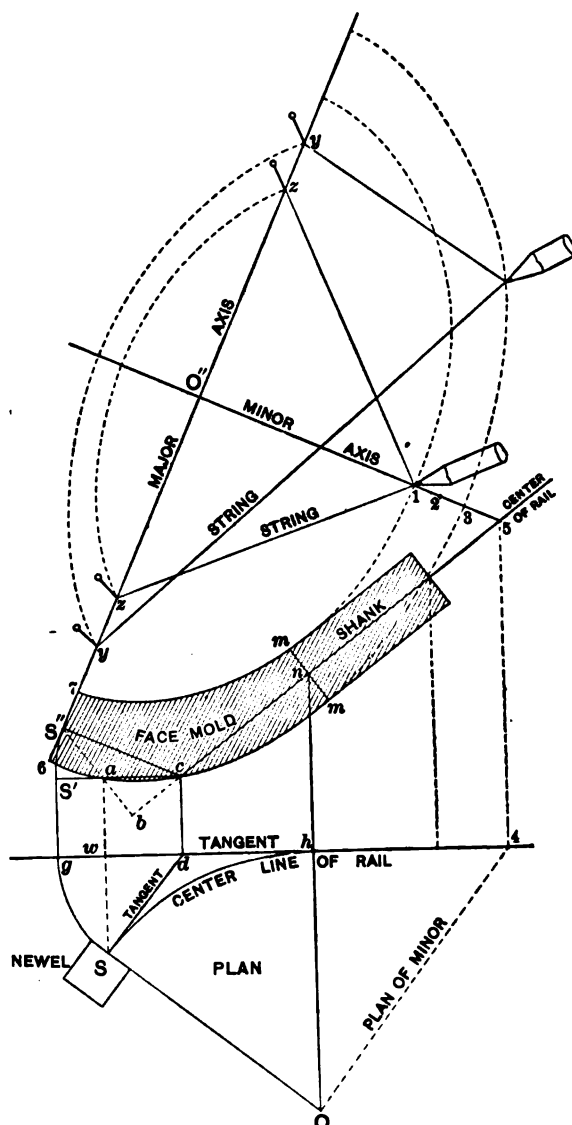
Manner of Laying Out Face Mold by Means of String and Pins.
